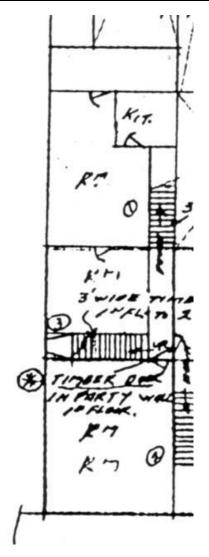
141 George Street, Ground Floor Sketch Plan, 1943. At ground floor level, 141 George Street consisted of two main rooms, the rear room partitioned to separate it from the adjacent passage and stair to the first floor. To the west, a narrower wing with a side breezeway contained a passage with a door to the rear breezeway and yard. A WC at the rear of the property was accessible via the yard. Running behind the property is a lane 7 feet 9 inches wide. This lane was also noted behind 143 – 143a George Street (see Figure 60). Source: City Council Surveyor's sketches, Nov. 1943.
